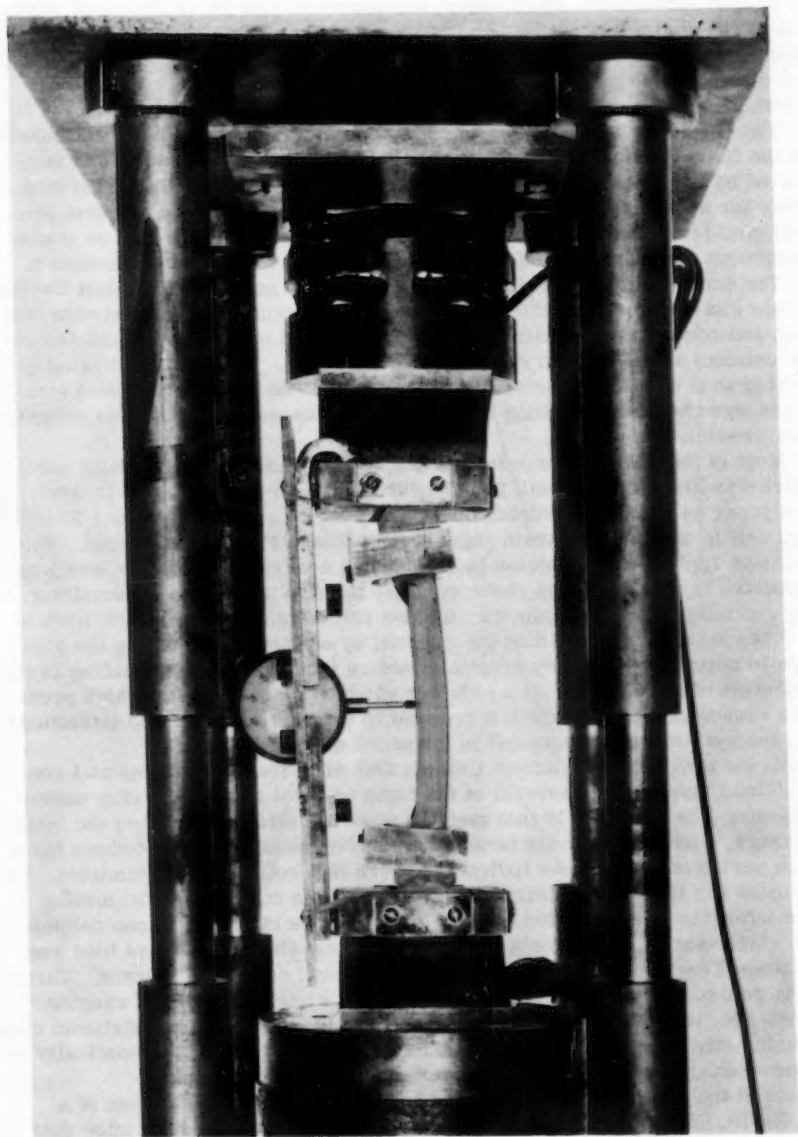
TYPICAL SETUP OF COLUMN IN CONSTANT
